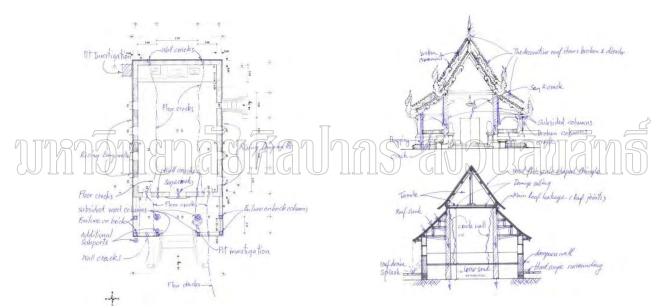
Investigation record and plan, elevation and section of the *vihara* in *Wat* Baan Ko, Lampang (sketched by Vitul L., 5/10/06)
